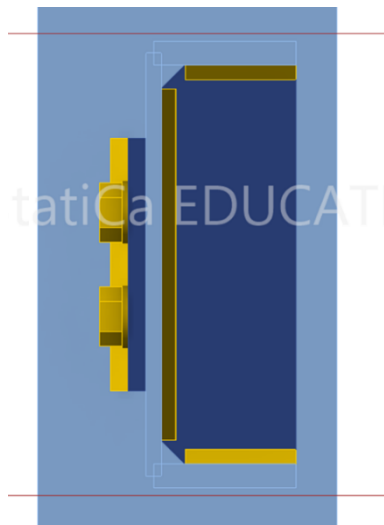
Cross-Section for stiffeners and Weld on UPN beam.
